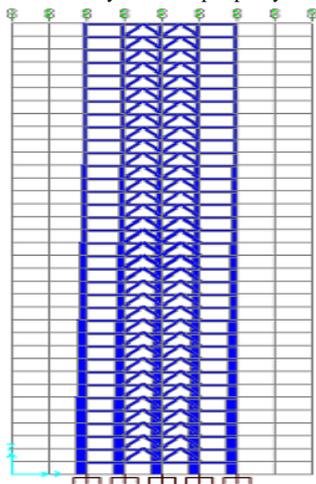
Elevation of 35 storey model showing Chevron (inverted brace) in two central bays at outer periphery.
